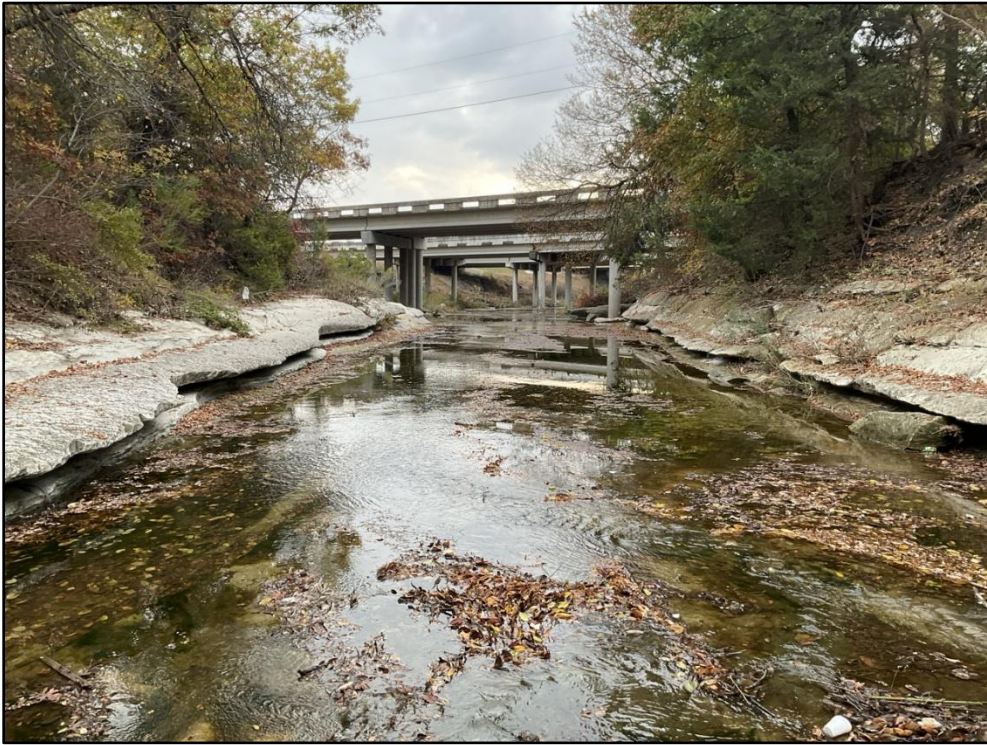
Near STA 8+50 – Looking downstream at the location of Tenmile Creek cross section 1.
